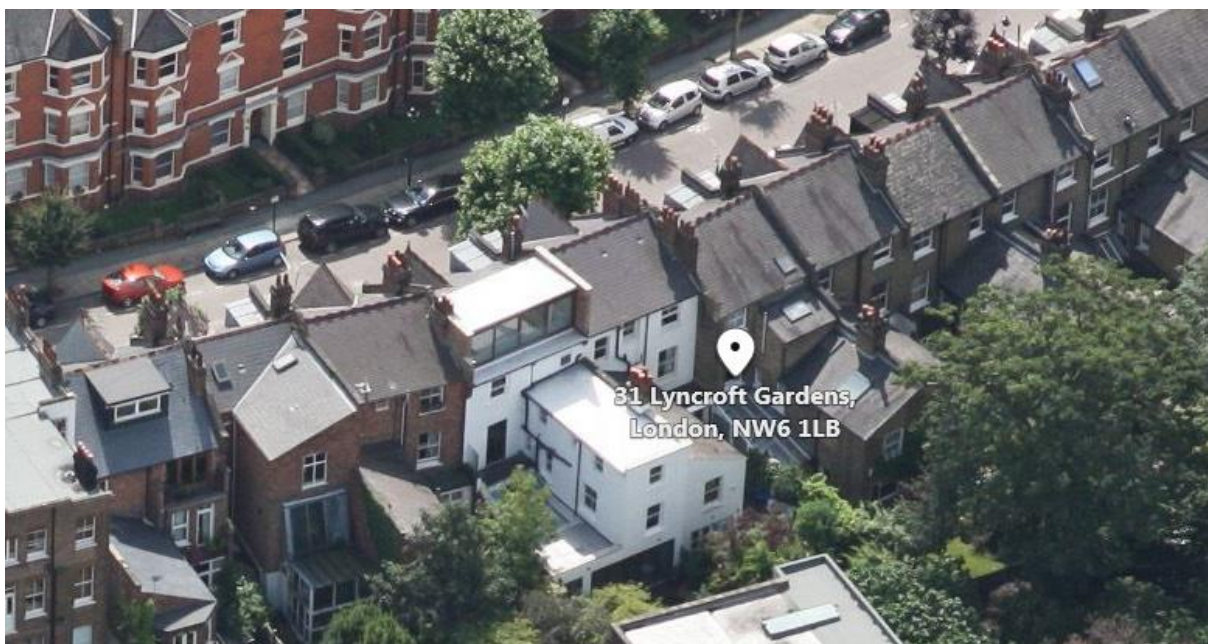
Aerial view of rear elevations of properties along Lyncroft Gardens looking east
